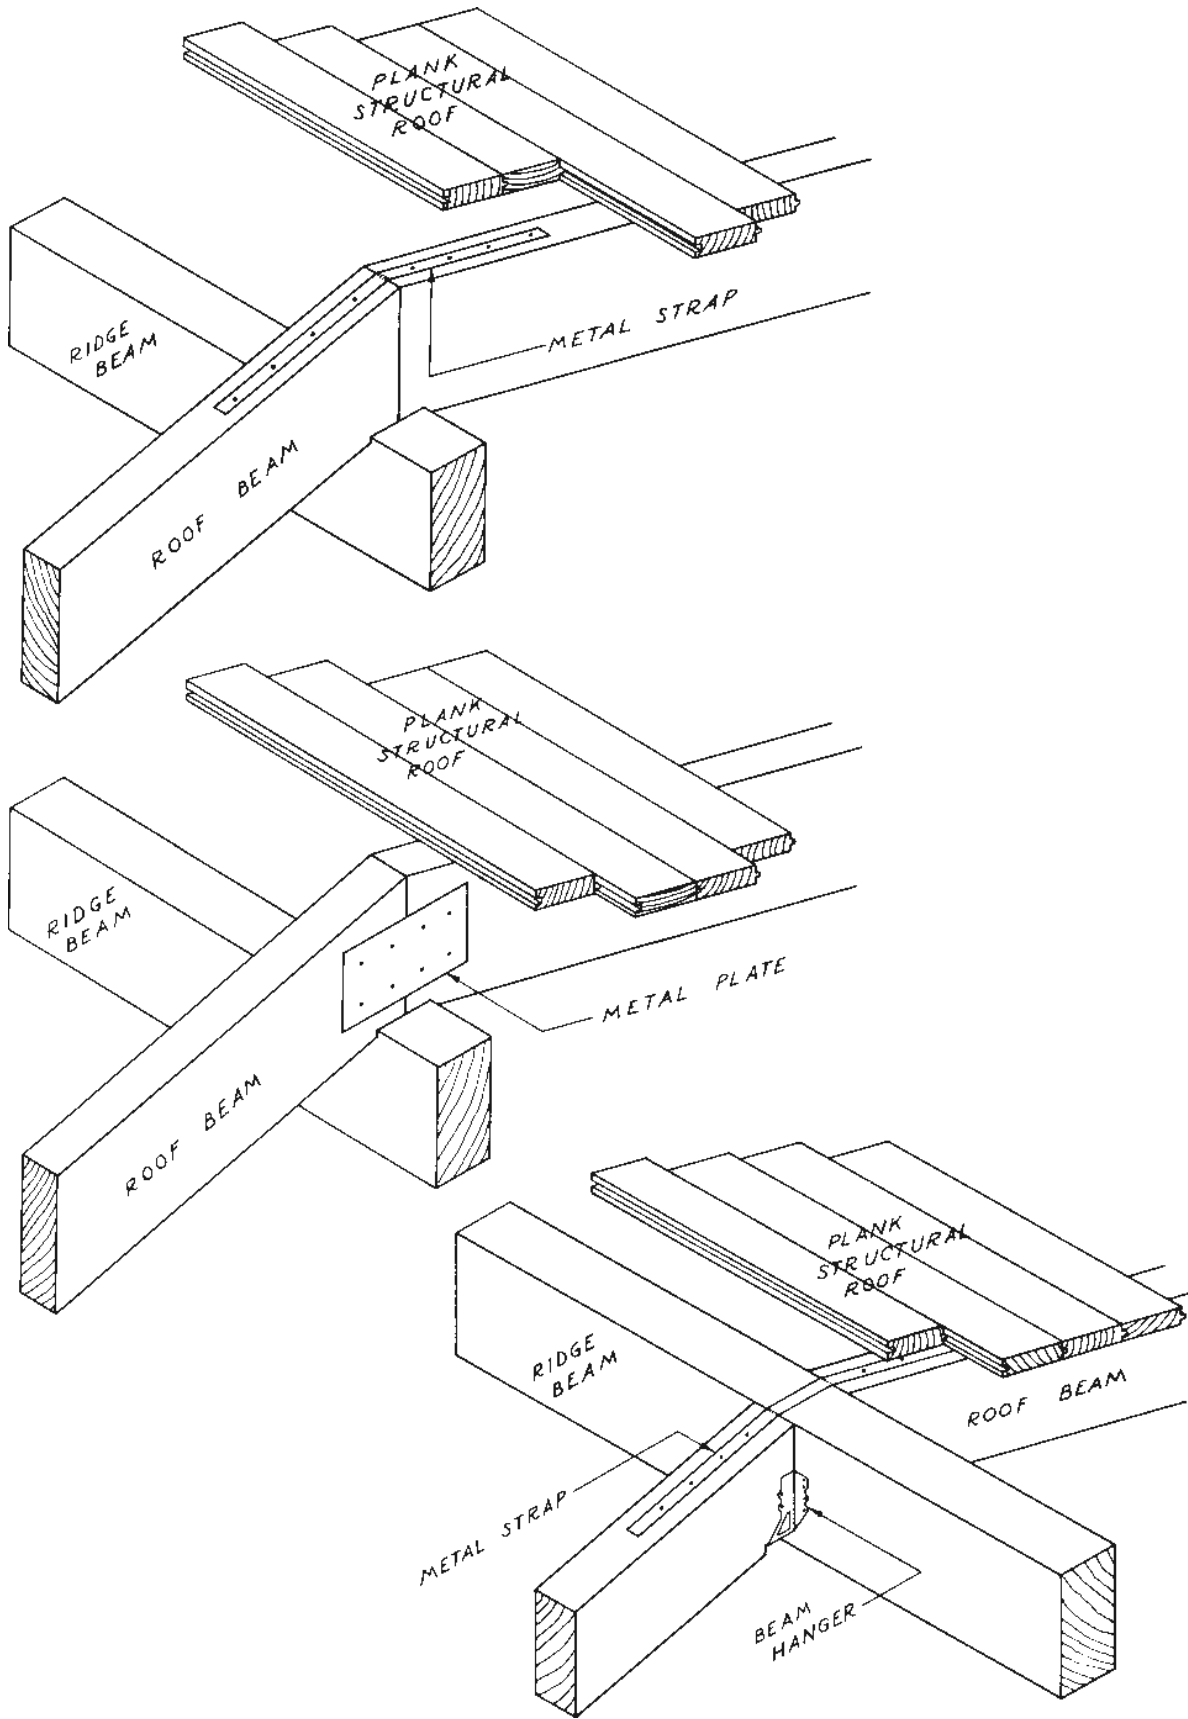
Arrangement of Roof and Floor Beams to Absorb Horizontal Thrust
